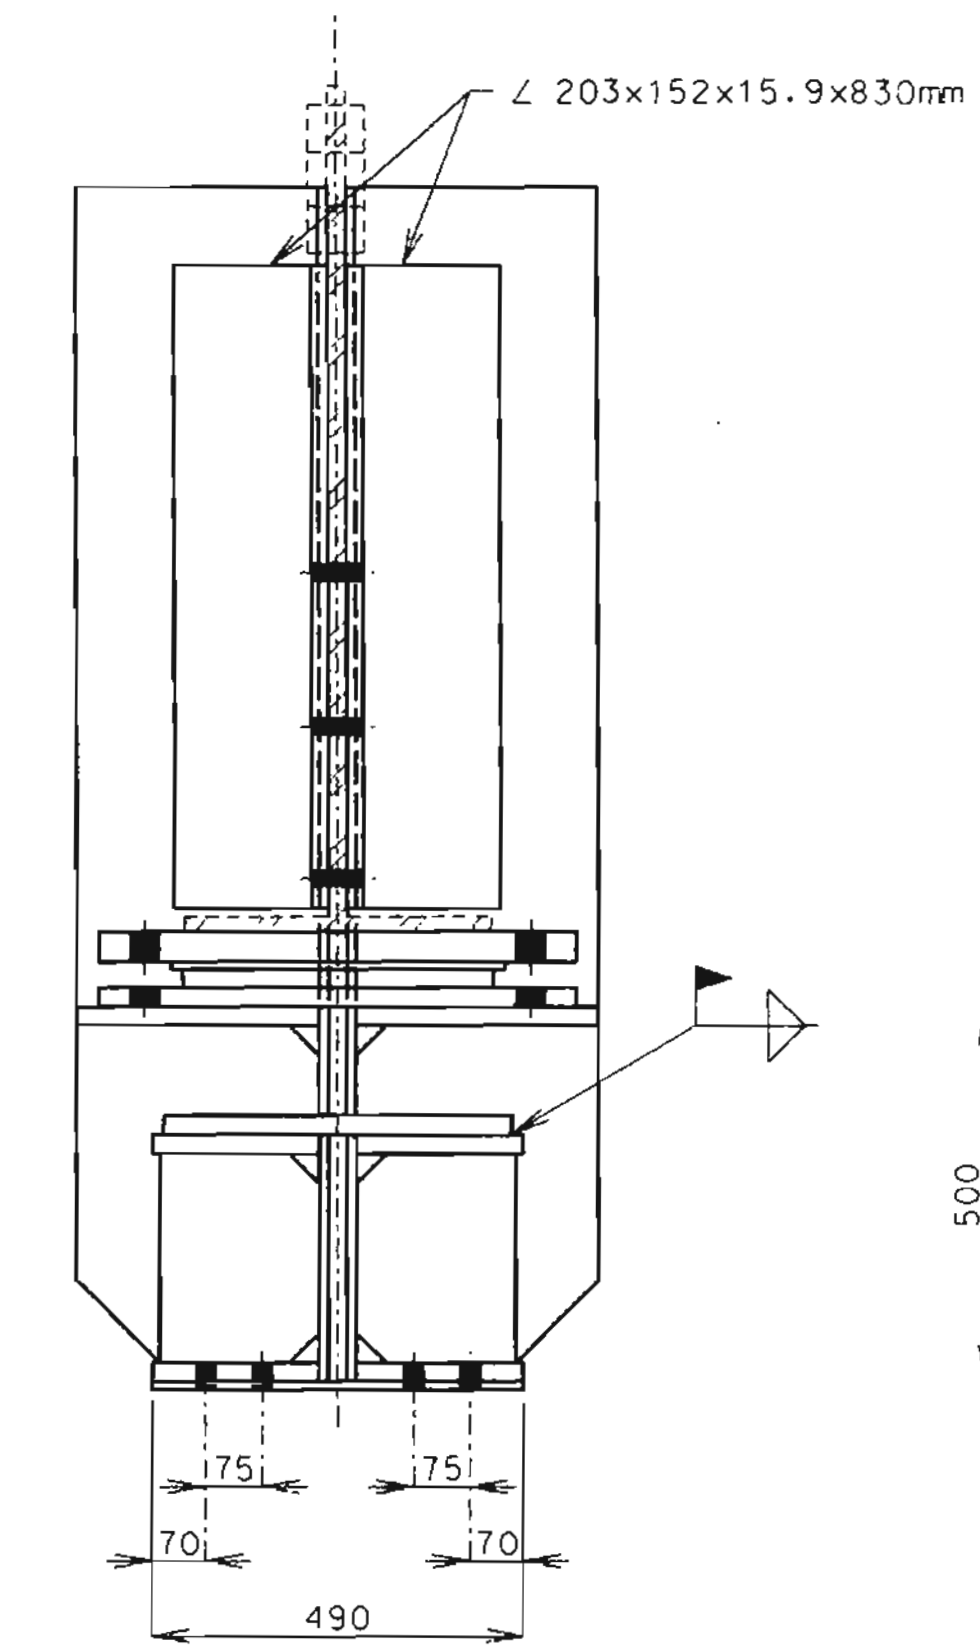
DETAILS SHOWING REHABILITATION OF LEFT WING AT END BENT NO. 10
